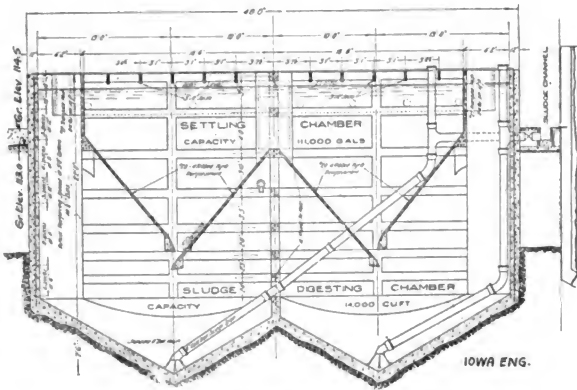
A. Detail Section of Main Settling Tank Section on C-C
